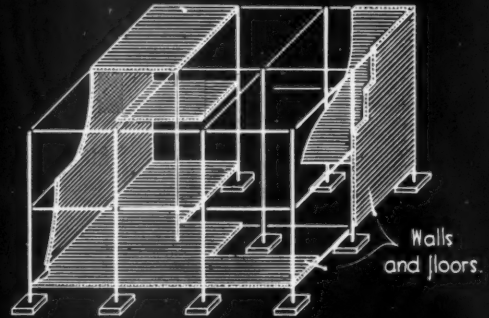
Steel frame skeleton stiffened by floor and wall slabs.
